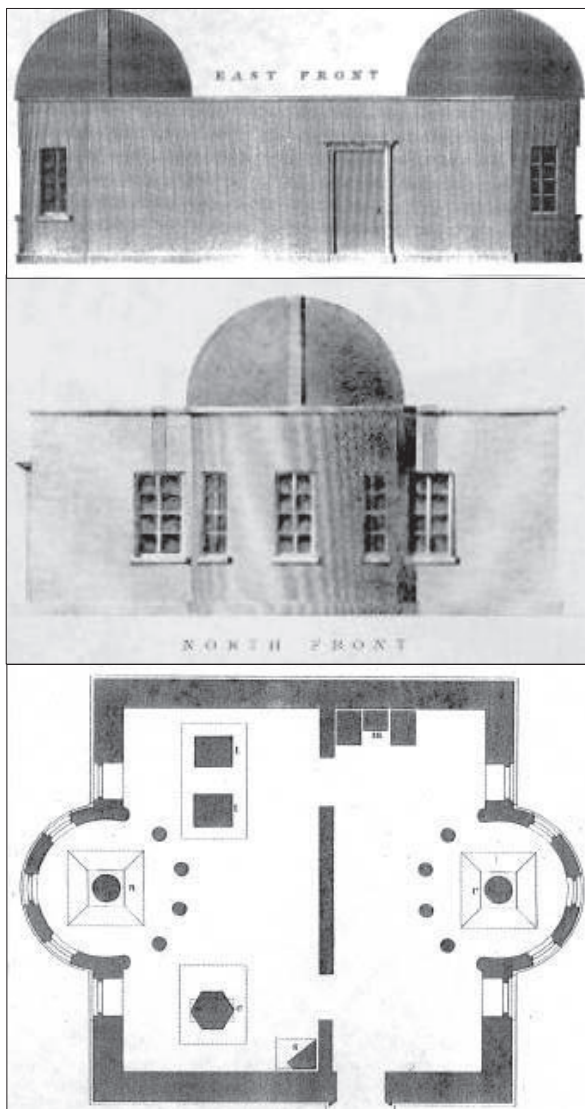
Side elevations and plan view of the Parramatta Observatory (after Richardson, 1835).
